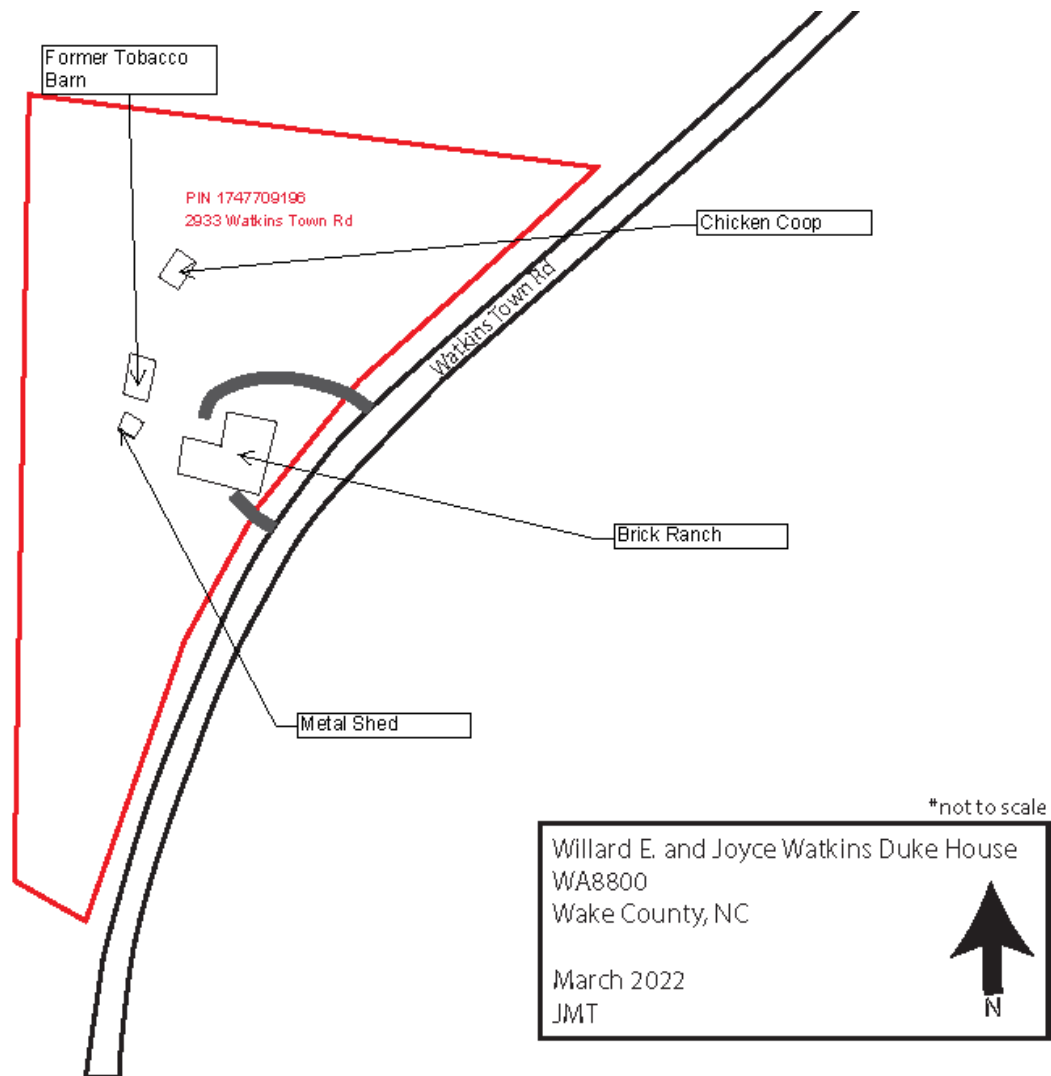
Willard E & Joyce Watkins Duke House Site Plan
